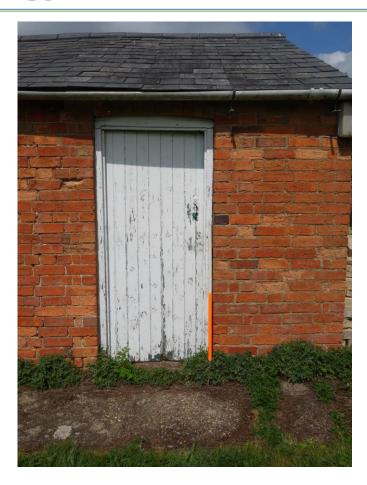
View looking NW showing detail of doorway at NE end of front elevation of schoolroom, with construction break visible to left of doorway
